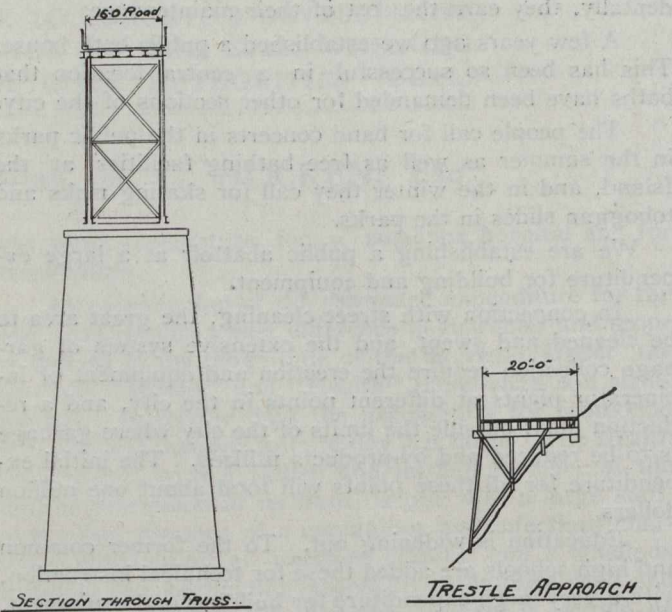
Sections at Abutment and Trestle, Lytton, B.C.
